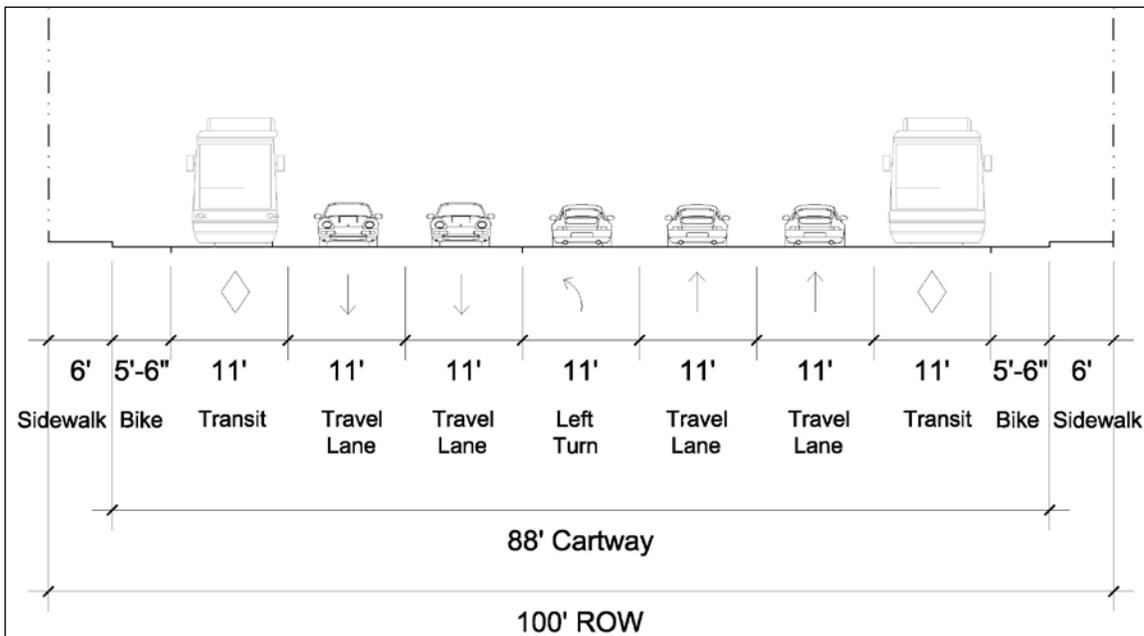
Dedicated transit lanes could be added within the existing street cross-section on Van Dorn Street if the median were eliminated and power lines relocated.
